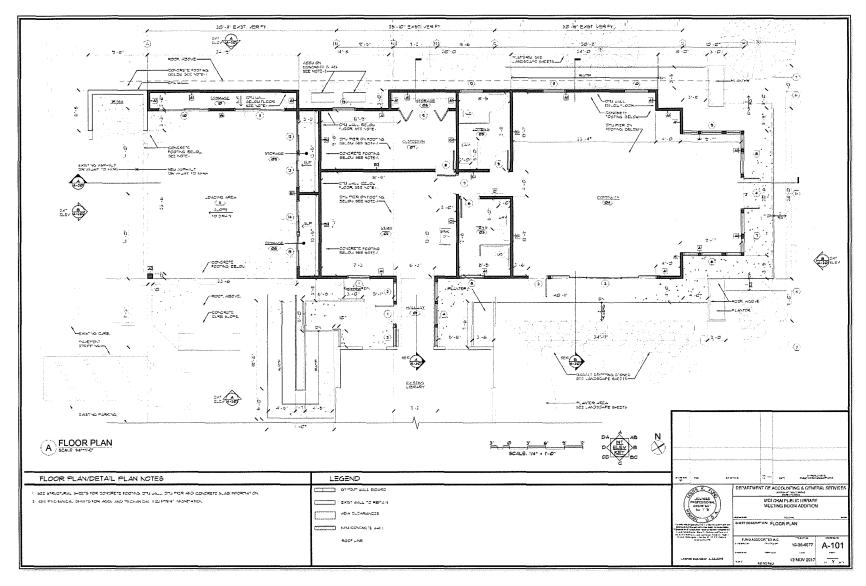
Proposed floor plan showing the location of the existing library (bottom) in relation to the meeting room addition (plan courtesy of Fung Associates, Inc.).
